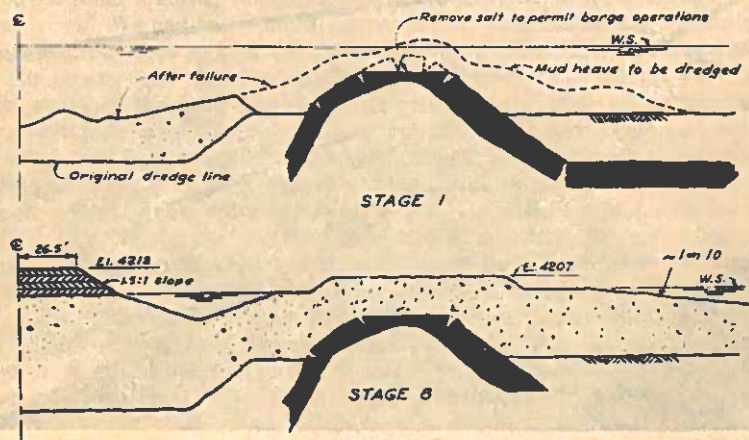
CROSS-SECTION THROUGH "MIDLAKE FAILURE" ILLUSTRATING METHOD OF RECONSTRUCTION
